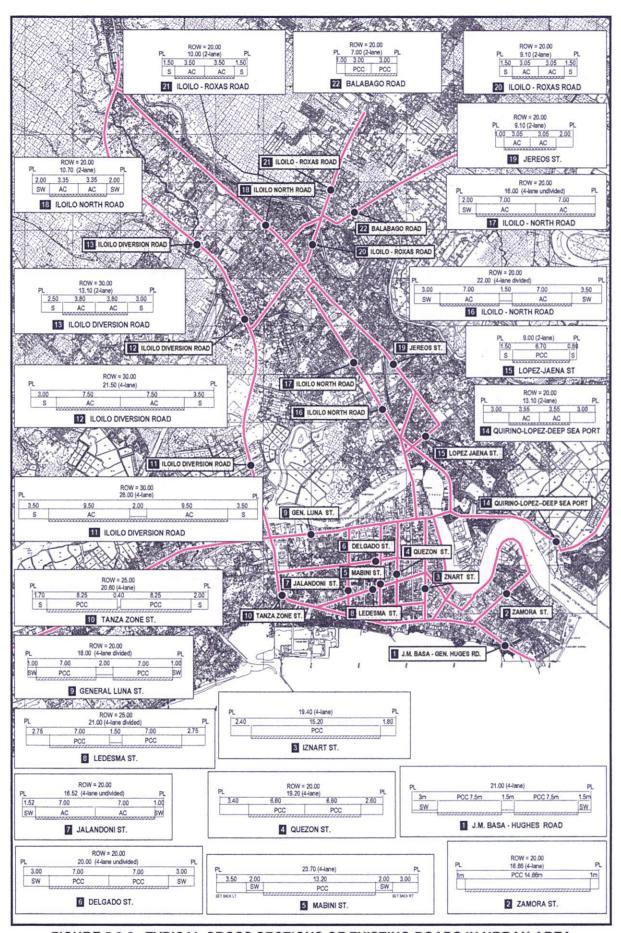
TYPICAL CROSS SECTIONS OF EXISTING ROADS IN URBAN AREA METRO ILOILO
